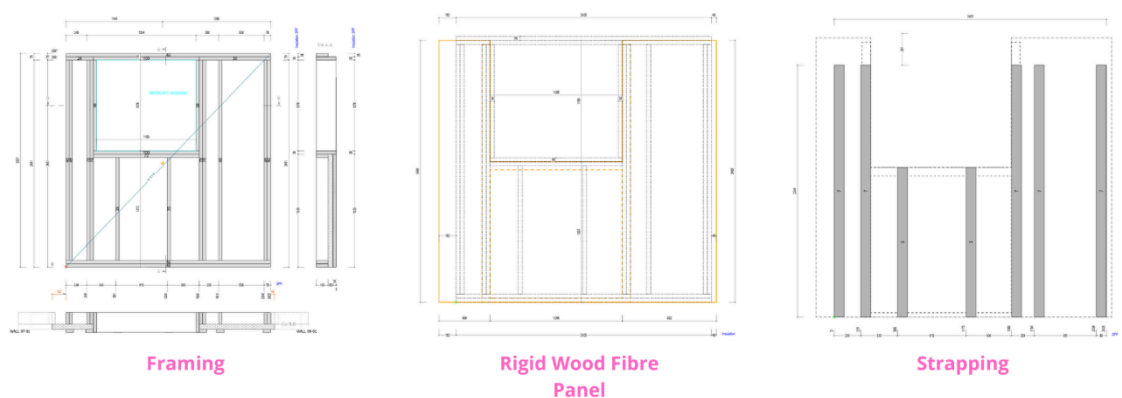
Examples of 3 types of construction drawings created to guide the prefabrication of the PEER panels.
